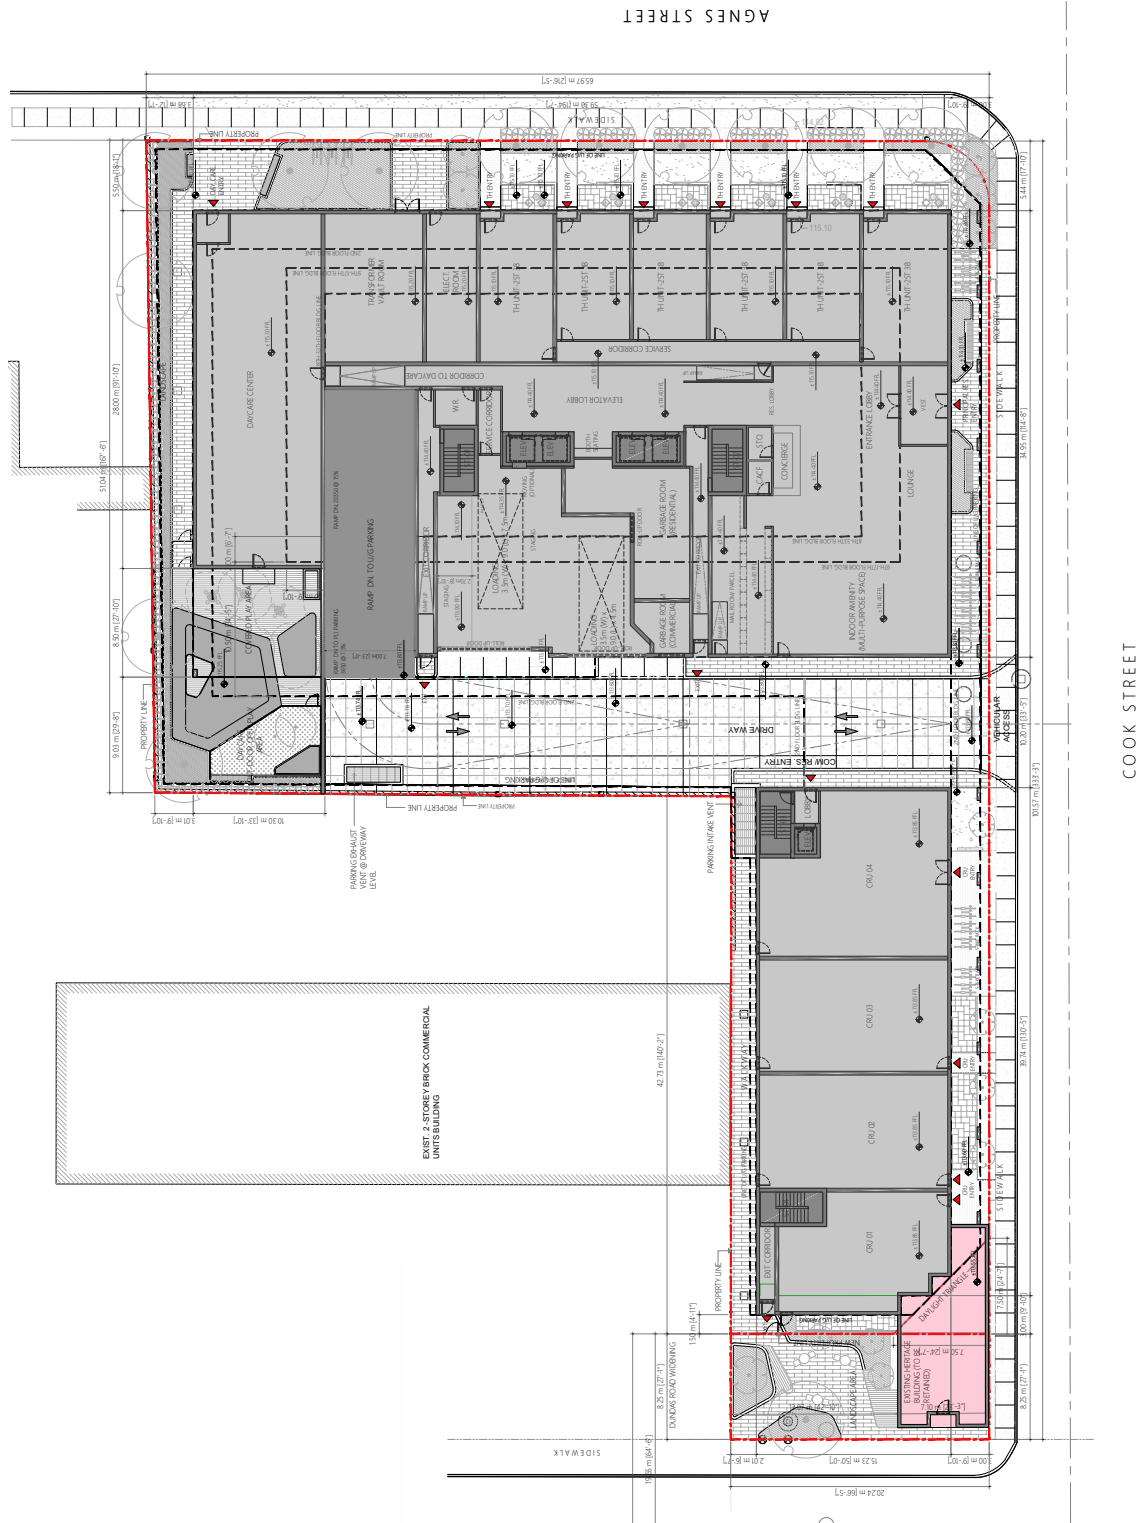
Proposed site plan (RA Lumbao Architects, 2025).
